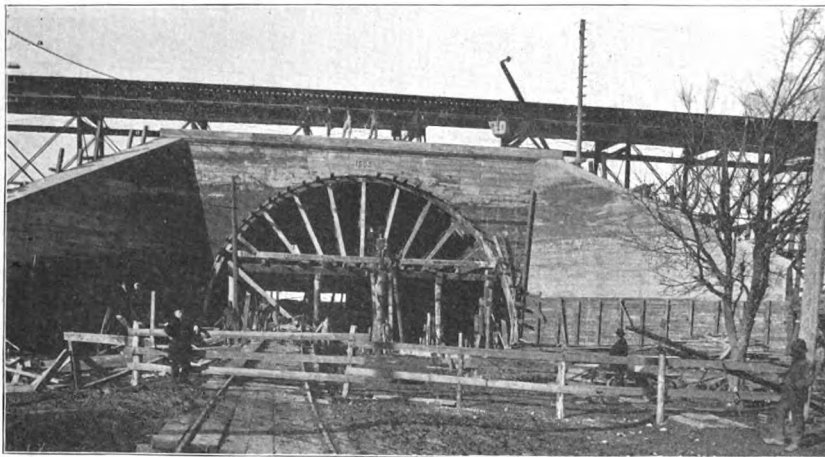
CENTERING FOR THE 60-FT. CONCRETE ARCH BRIDGE AT CAIRO.
